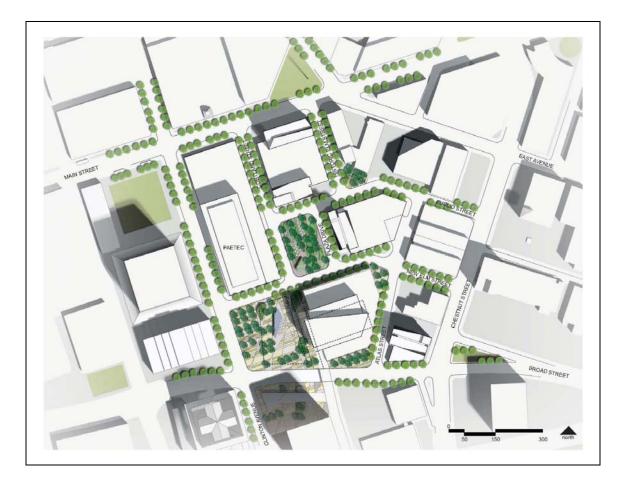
, PREFERRED ALTERNATIVE CONCEPT SITE PLAN
